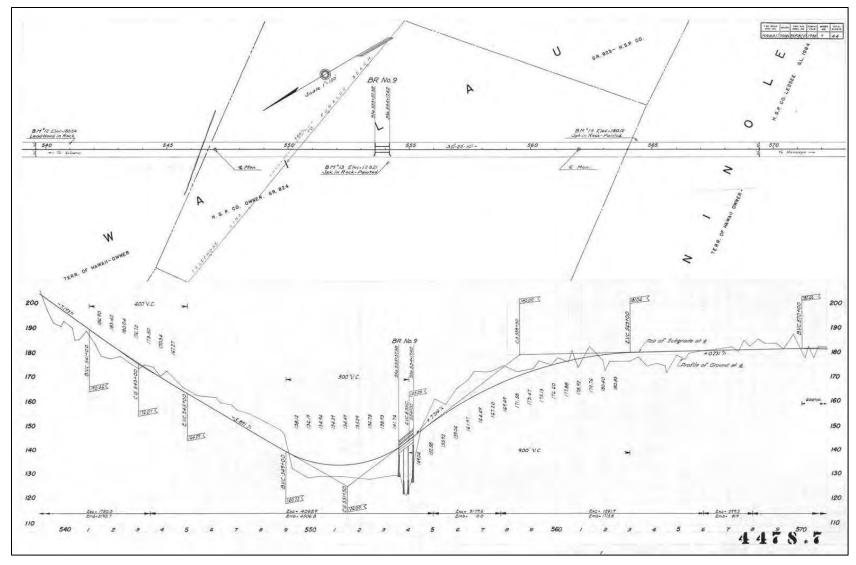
1938 Territory of Hawaii, Territorial Highway Department, highway plan and profile showing the location of Bridge No. 9 (Nīnole Bridge) along Highway 11 (Māmalahoa Highway)
